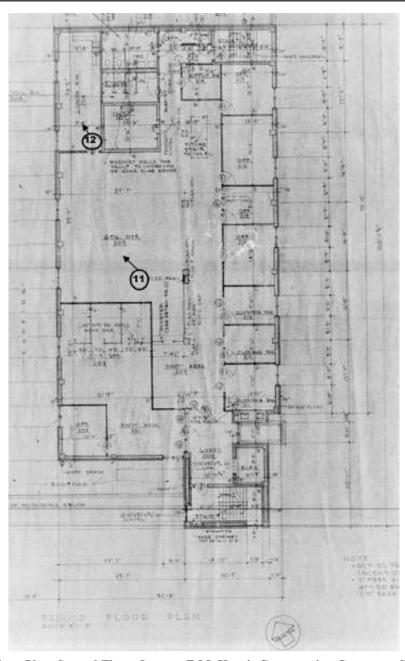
Floor Plan, Second Floor. Source: E.M. Harris Construction Company, St. Louis, MO
